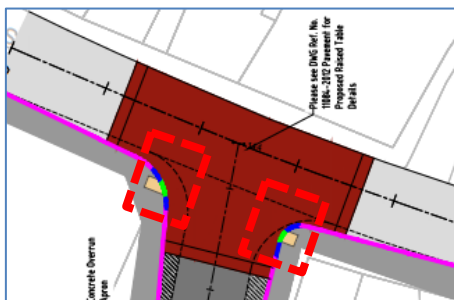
Proposed Tactile Paving at junction of the N51 / Town Parks
